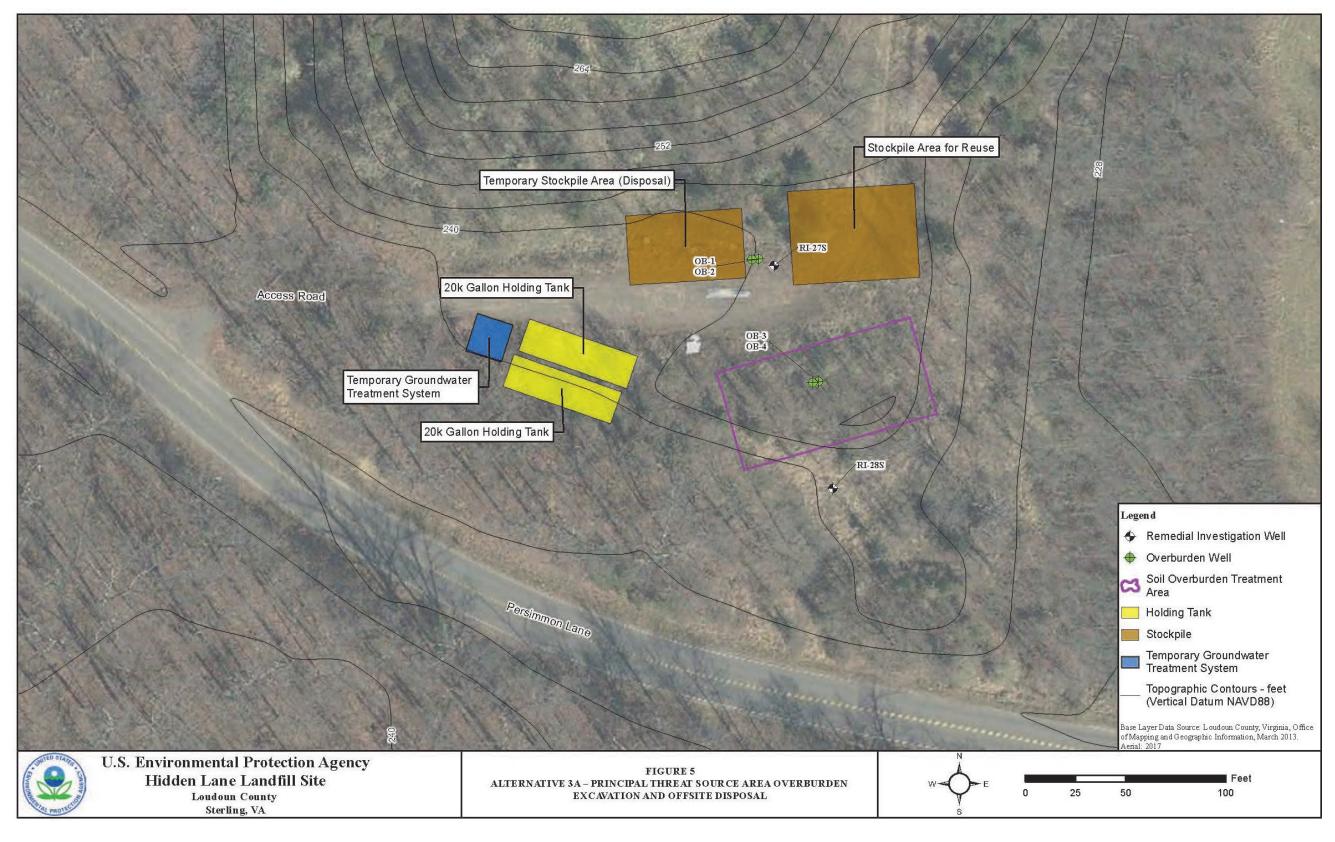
Alternative 3A – Principal Threat Source Area Overburden Excavation and Offsite Disposal
